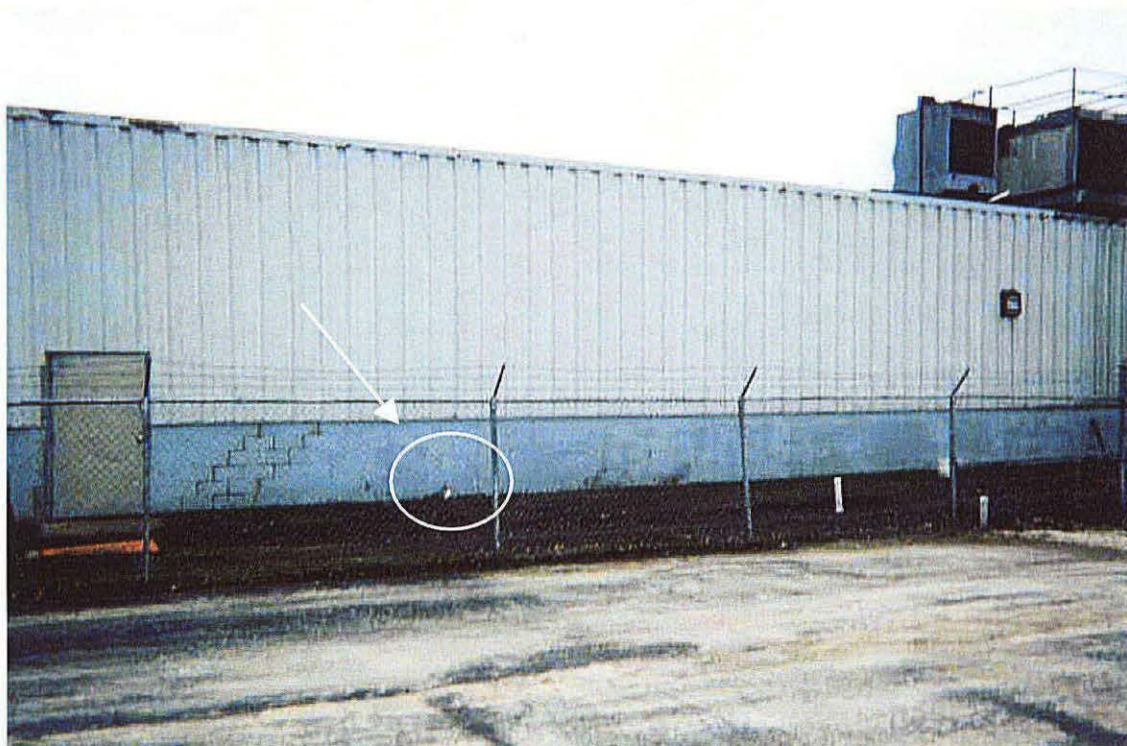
Looking southeast, picture of site following restoration, and the manifold pipe constructed to the surface and capped. Manifold pipe is in the location where it will be connected with the indoor plumbing from the storage tanks.
